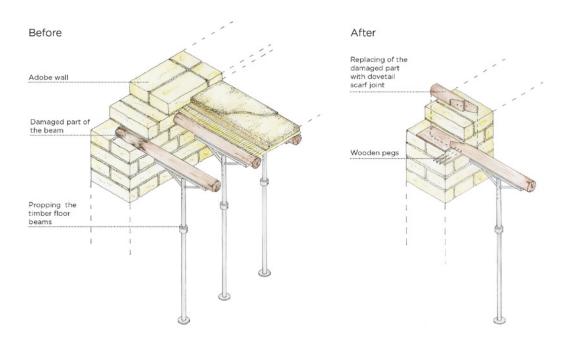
Repair of a support beam of a floor, before and after intervention. Source: Alessandra Sprega for the J. Paul Getty Trust.
